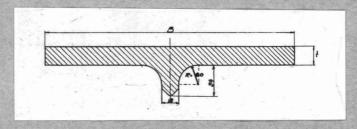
Rolled Flange Section For Welded Girders Used In Sweden
